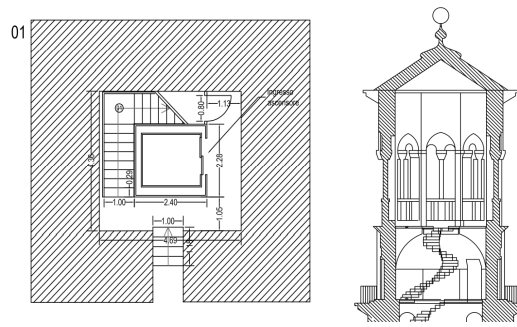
Section of Lamberti Tower at the level of the courtyard “mercato vecchio” and on the right section of the top of the tower
